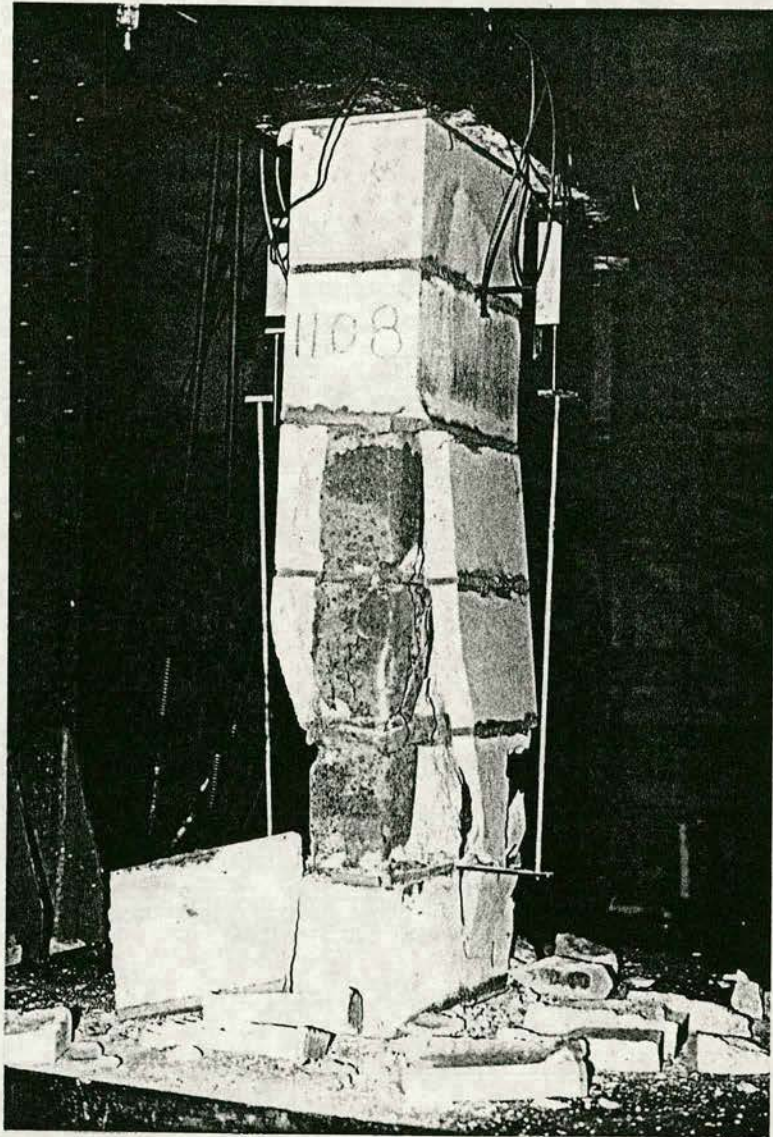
Mode of failure of full-block masonry column reinforced with 8 mm ϕ lateral ties.
